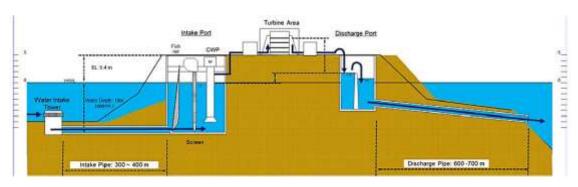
Cross-section of Intake and Discharge Structures Source: JICA Survey Team, 2018
